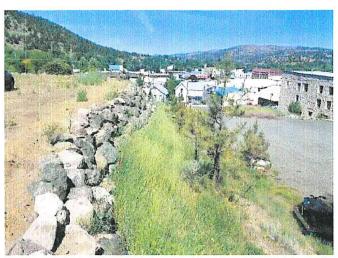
Looking southwest from a point near the corner of the existing boulder retaining wall.
